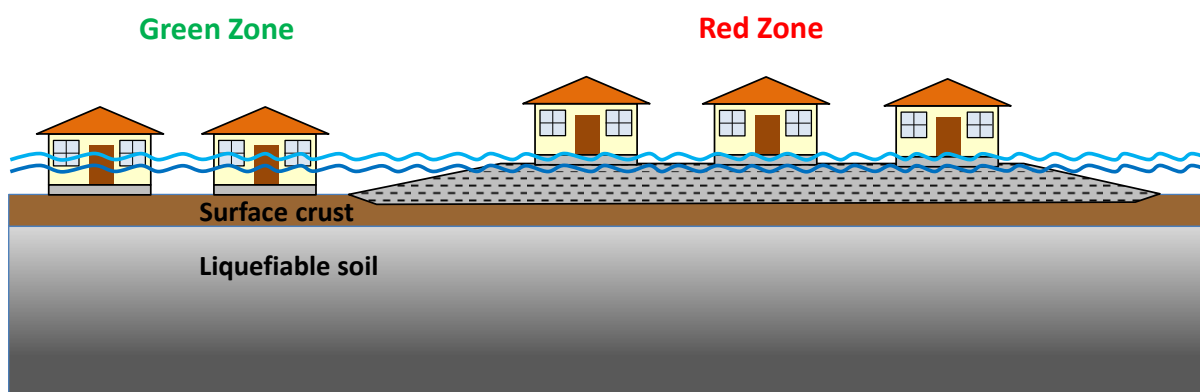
Concept 1 - Land raised by filling, with dwellings at new ground level. Dark blue line is 50 year flood level, light blue line is 200 year flood level. New dwellings have standard TC2-type foundations.
